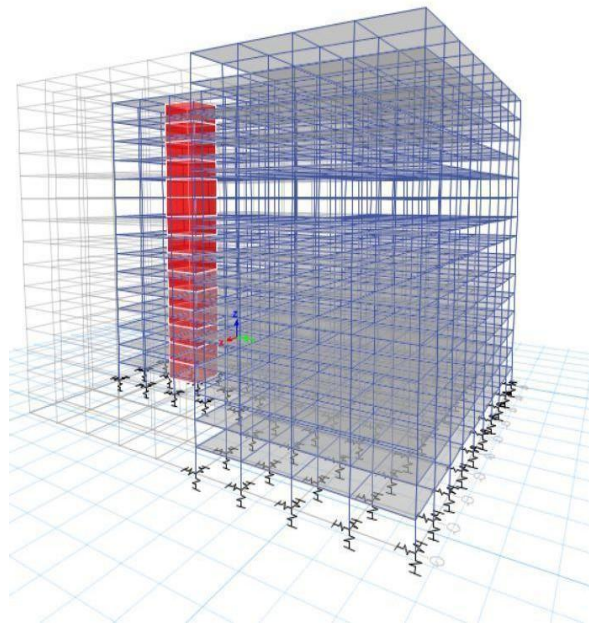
Spring Support Model Showing Soil-Structure Interaction at Foundation Level
